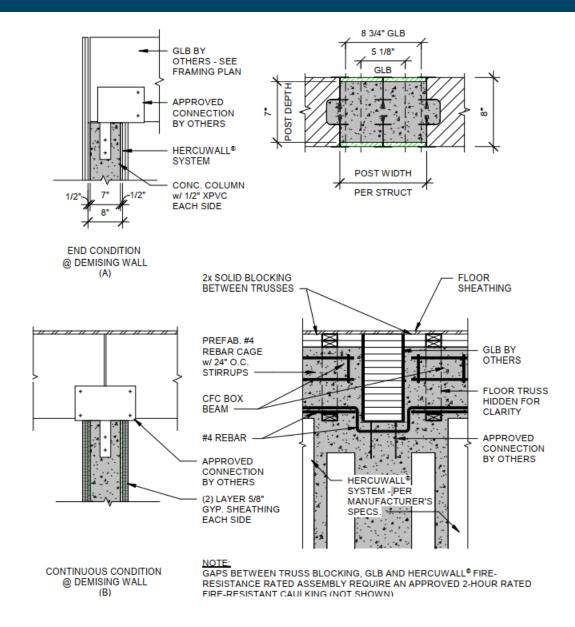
2-hr Beam Penetration of Load-Bearing CFC Box Beam Wall
